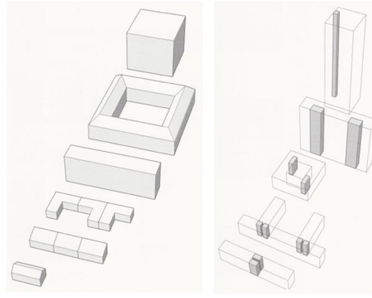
Typical forms and geometries of residential (left) and office buildings (right) - Source: Gerhard Hausladen et al.: *Climate design*. Birkhäuser, Munich, 2005
